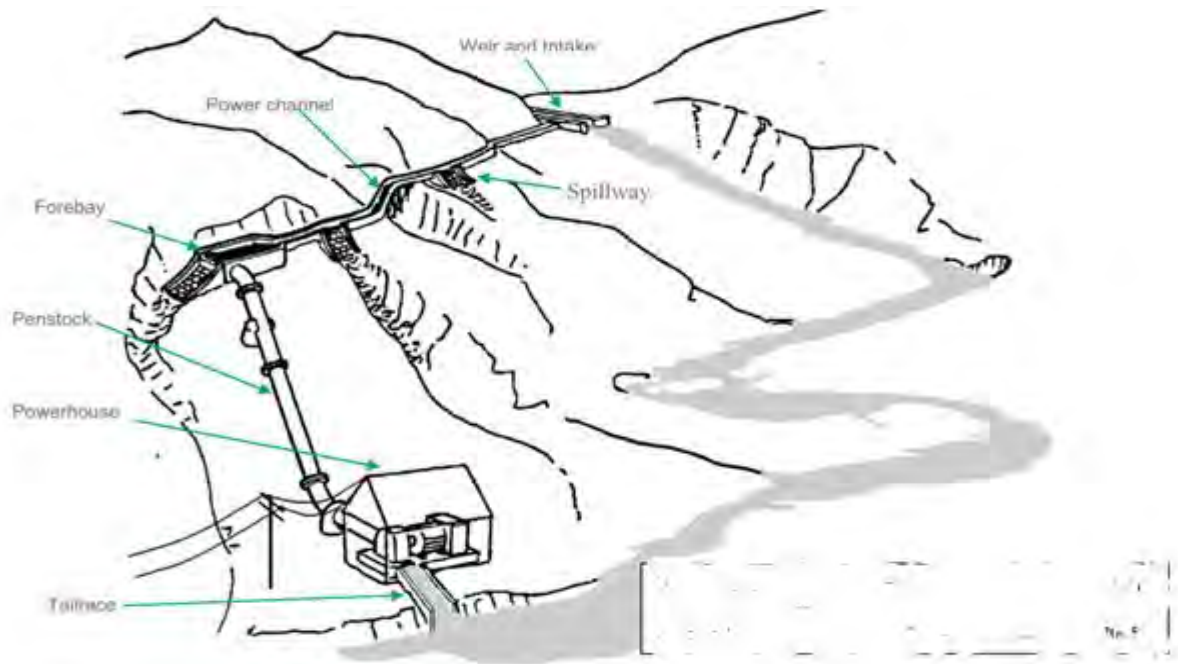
Schematic of a typical Diversion & canal hydro power plant (Dilip Singh, 2009)
